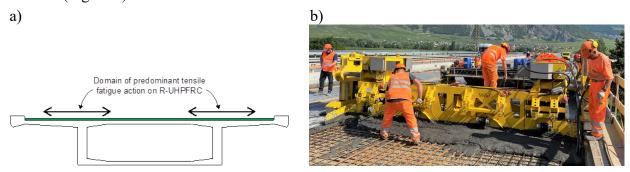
(a) cross section of a box girder and fatigue-prone domains, (b) casting of R-UHPFRC on top of the slab of the box girder of a road bridge.
